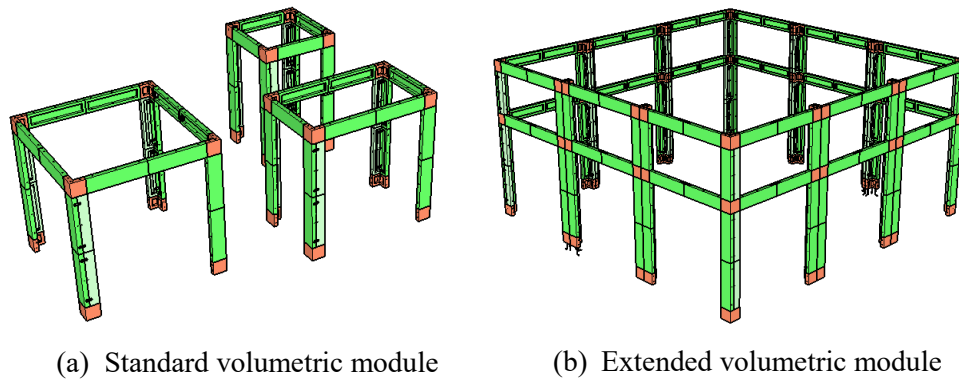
Standard and extended volumetric module of the proposed precast concrete structure.
